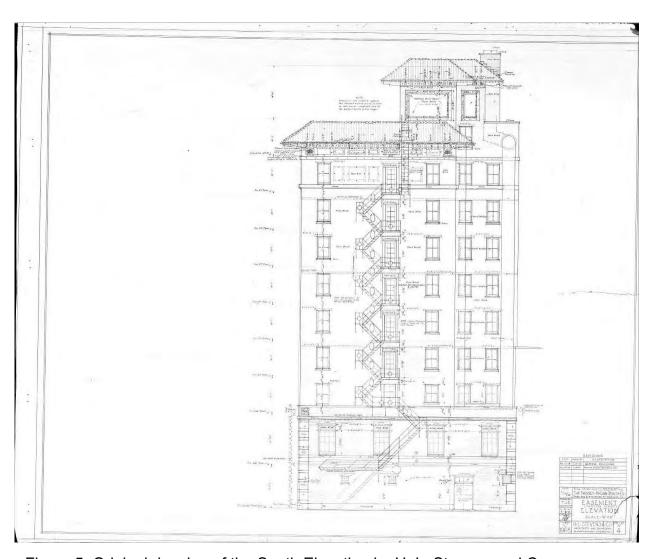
Original drawing of the South Elevation by H. L. Stevens and Company, 1928. From the collection of the building's owner, available in the management office, Park Towers Apartments, Waterloo, Iowa.
